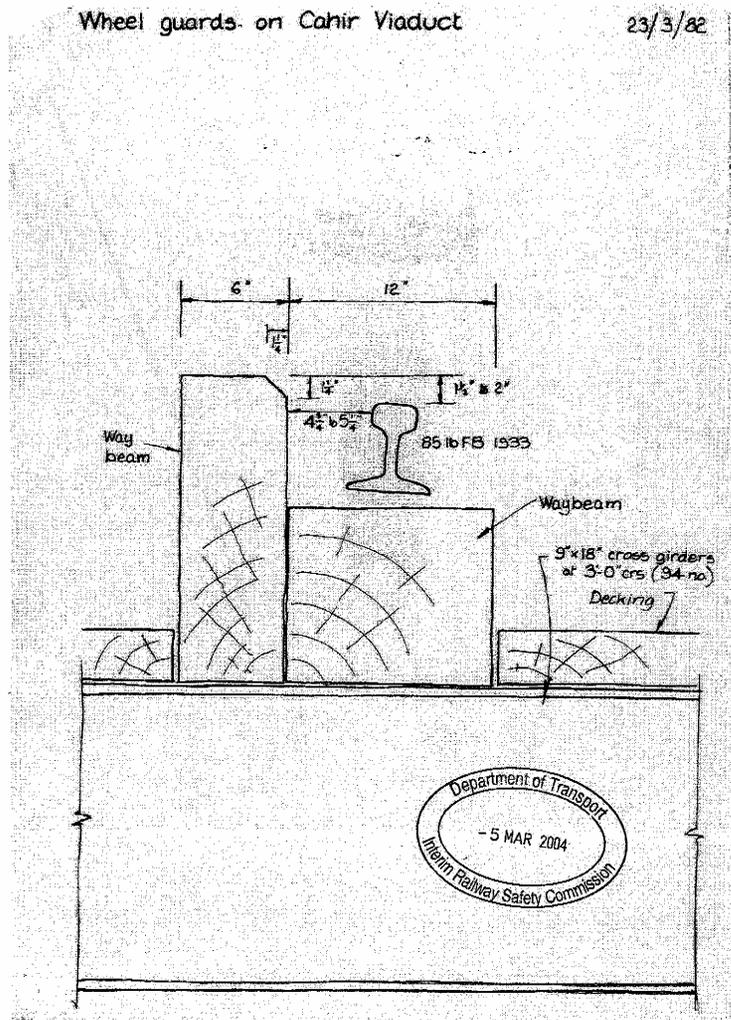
Cross-section detail of wheel guards (CIÉ Chief Civil Engineers, 1982)
